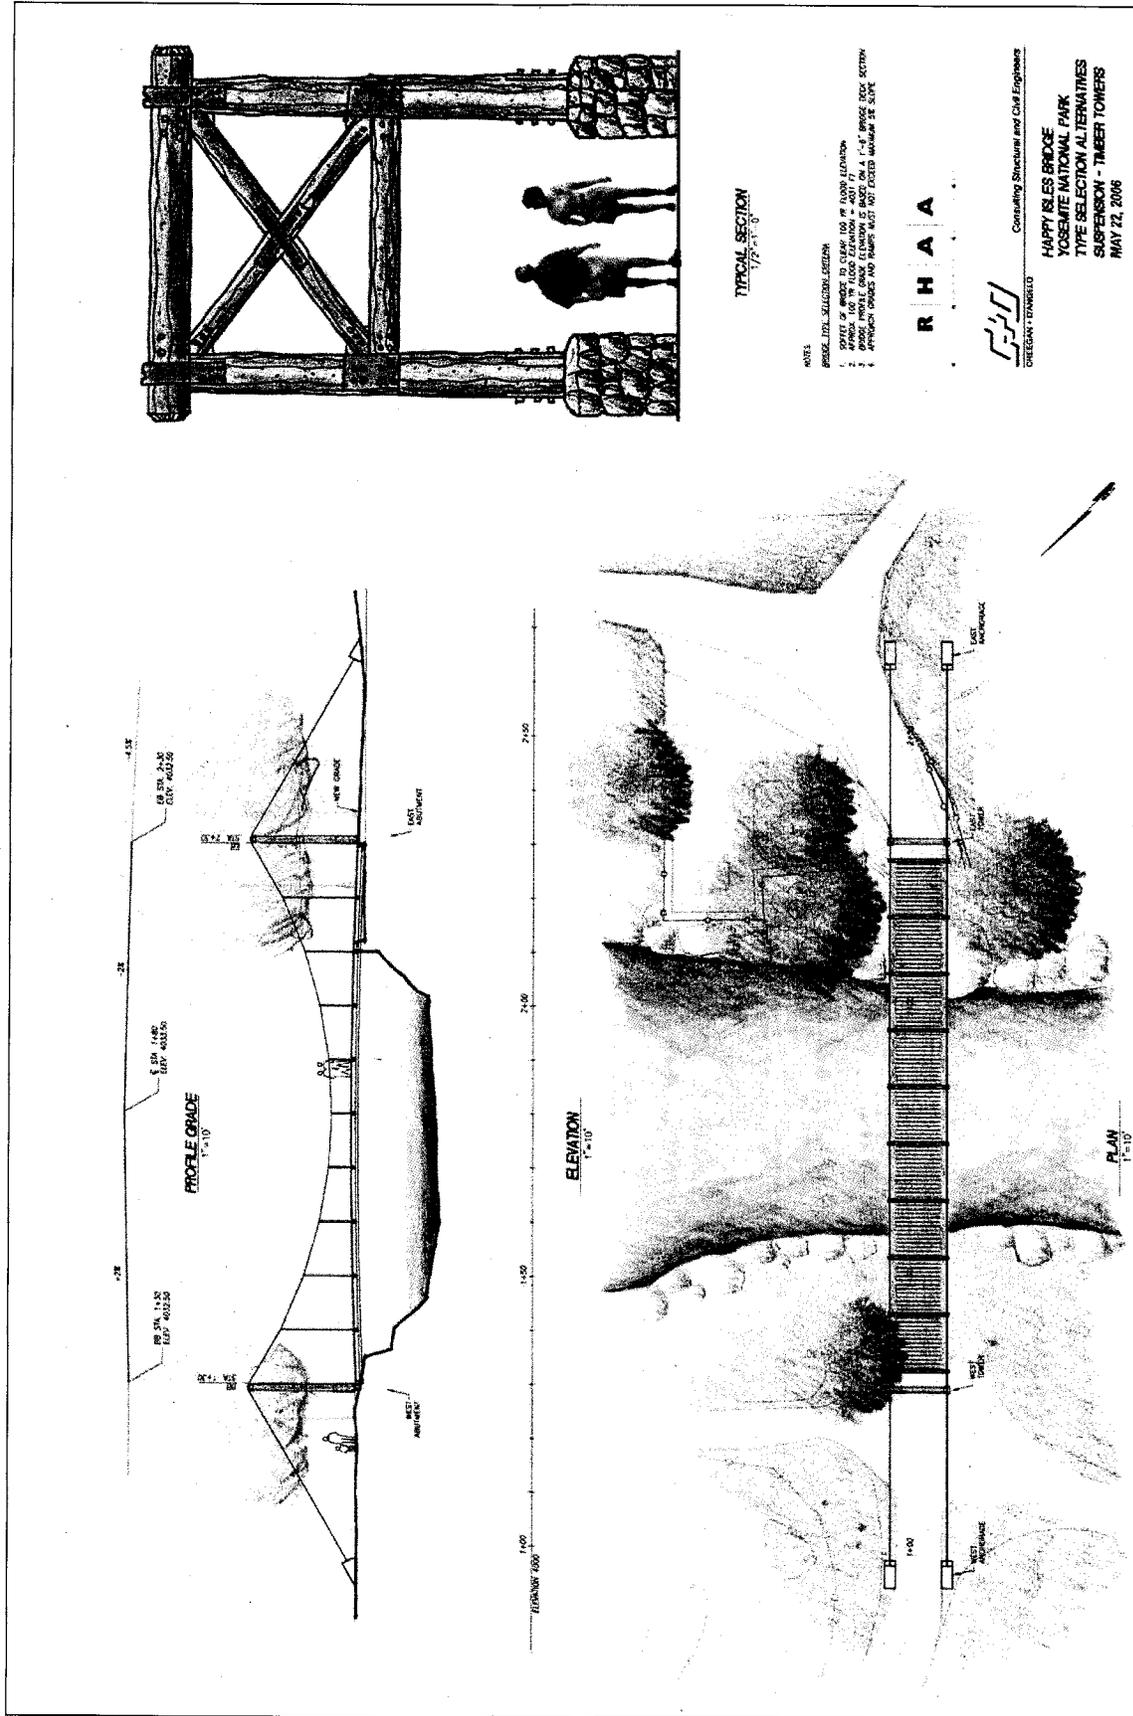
Suspension Bridge: profile grade, elevation, plan, and typical section drawings
